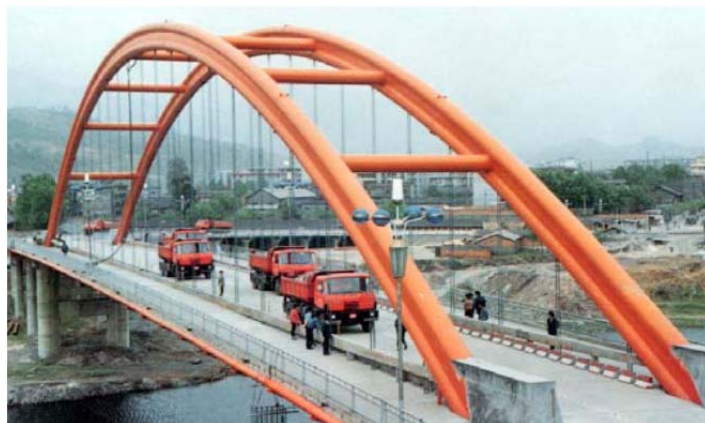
Wangchang East River Bridge (Span 115 meters). First CFST Arch Bridge in China.
